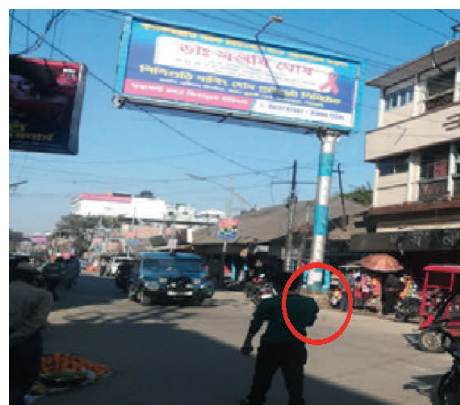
Overhanging hoarding installed blocking shoulder and footpath area at 0.500 km chainage of B.S. Road under Cooch Behar PW Division (01.01.2021)
